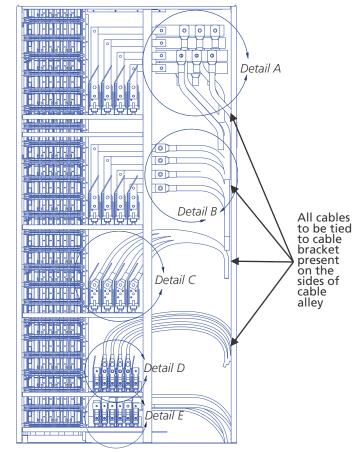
Side Cable Entry (Front View) Cables tied to cable bracket present on the sides of cable alley
